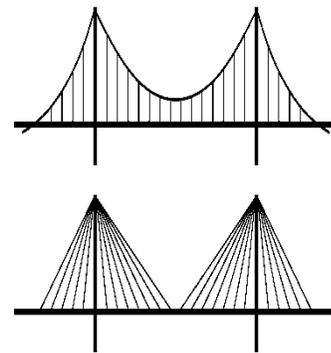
Suspension Bridge & Cable-Stayed Bridge
